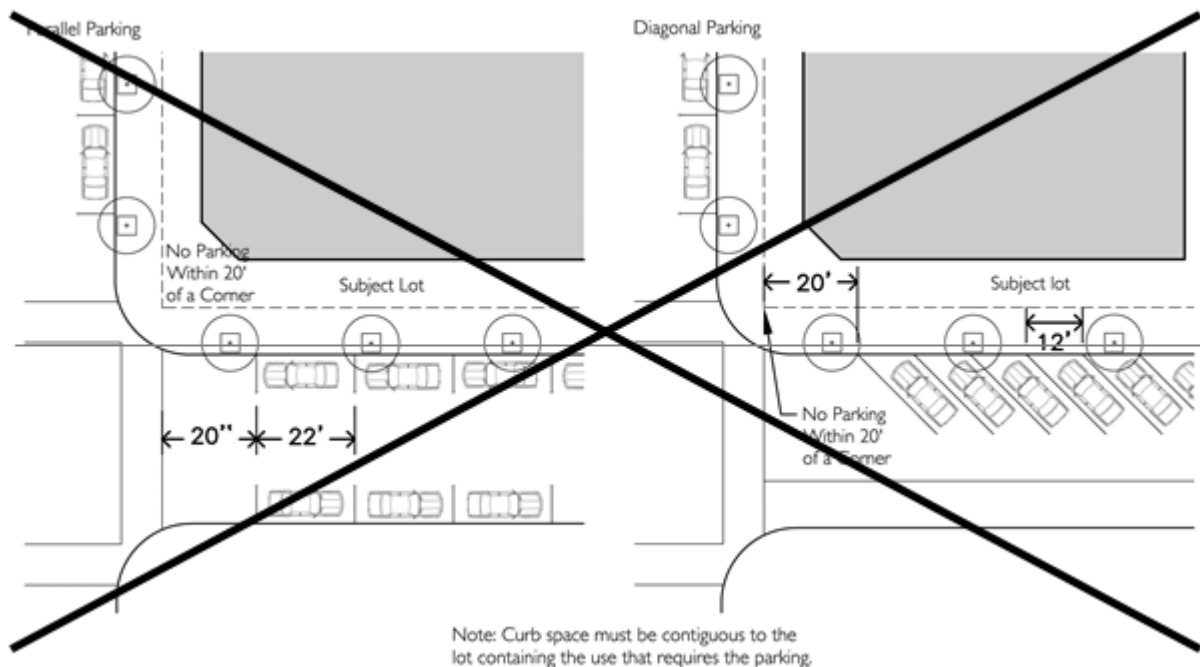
A.1. ~~On-Street Parking Credit~~
